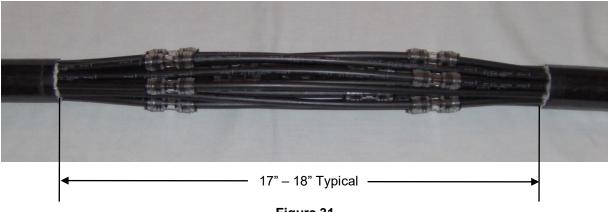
Odd – Even Tube Coupling Arrangement for 19-Tube Cable Example
